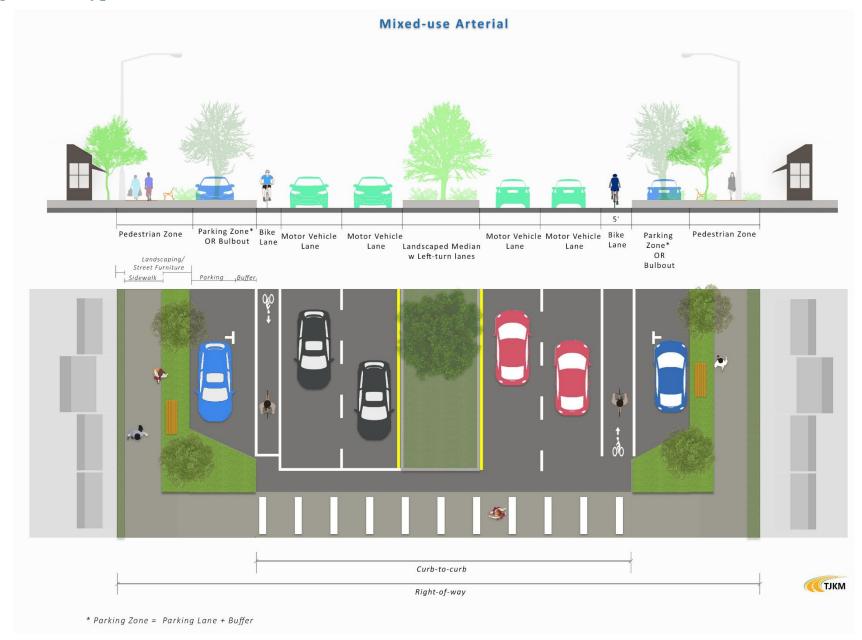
Typical Road Section – Mixed Use Arterial Street
